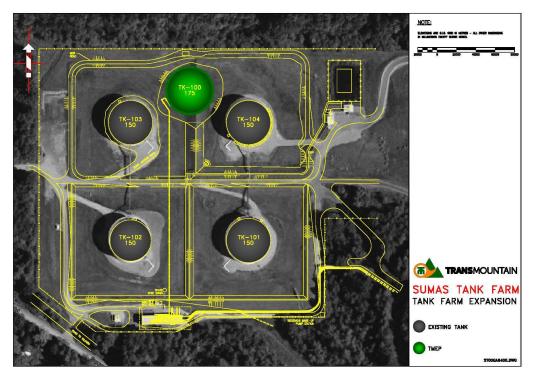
Sumas Terminal Proposed Plot Plan
